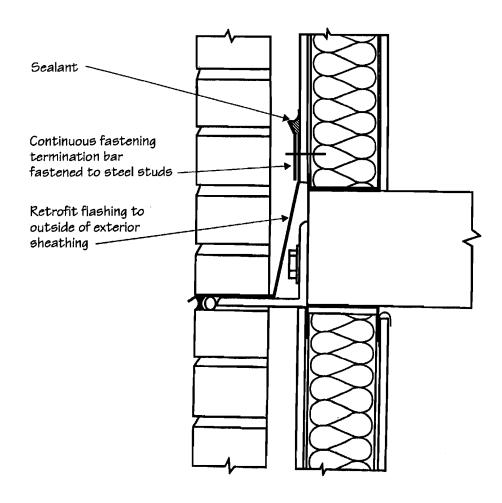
9 RETROFIT FLASHING DETAIL
